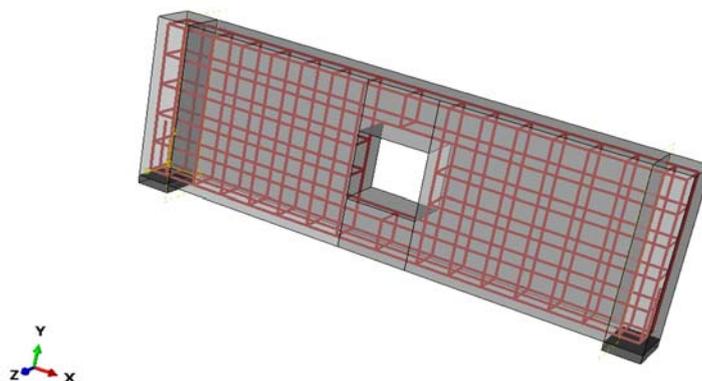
deep concrete beam (HSC) type DB\_HSC\_SO
